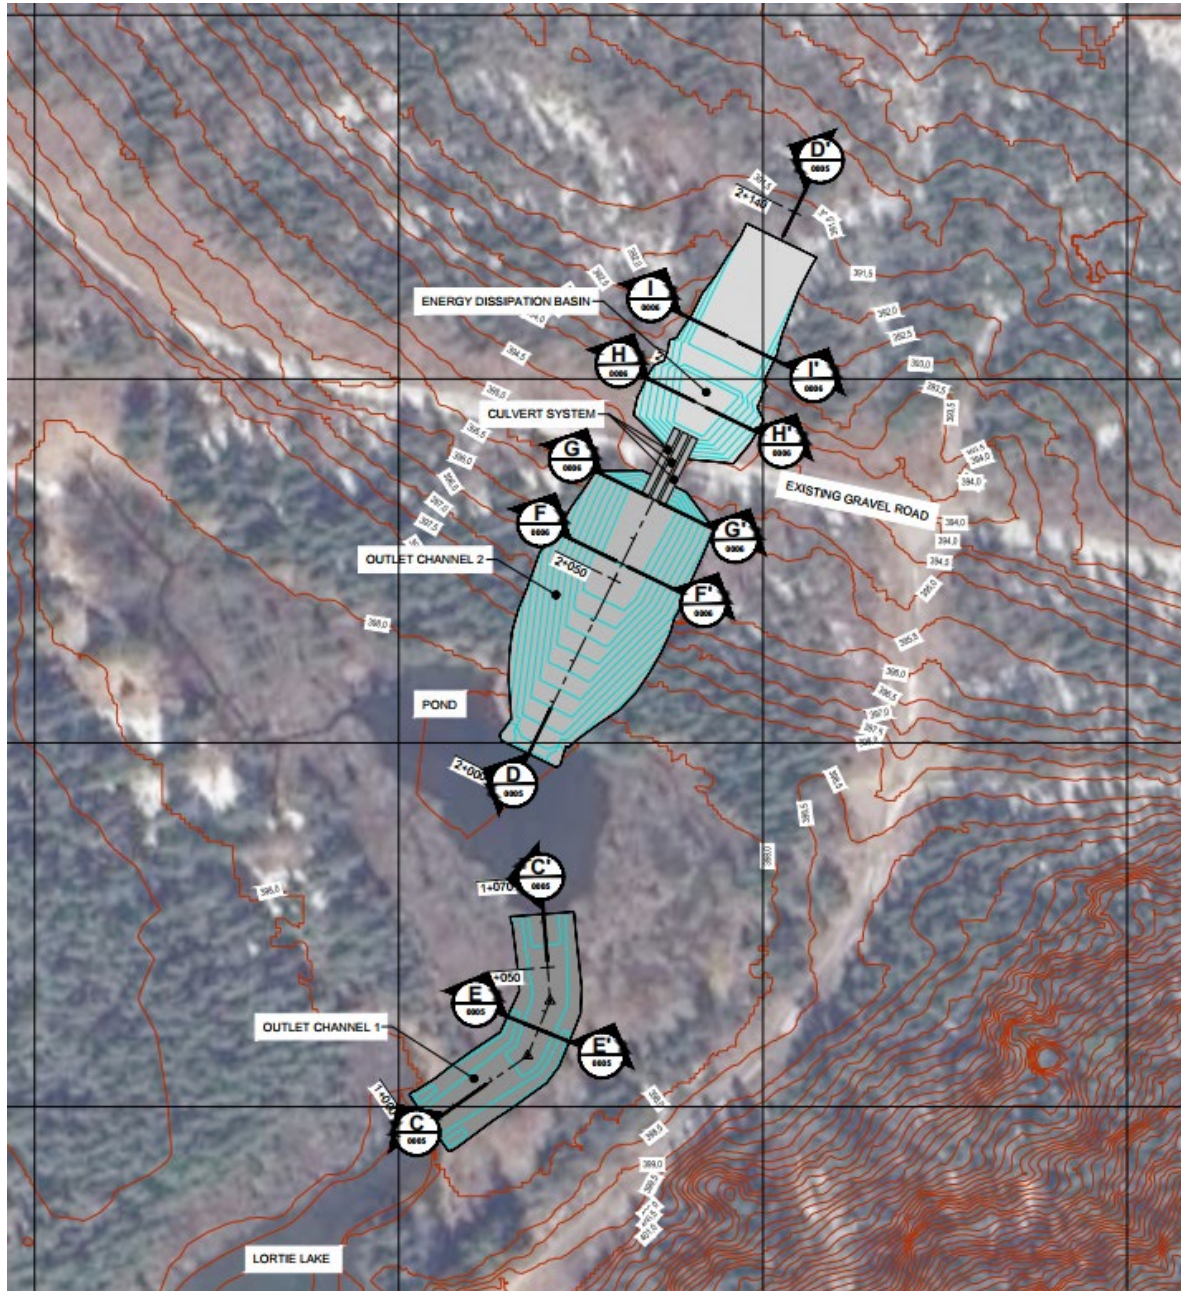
Plan View of the Lortie Lake Emergency Spillway
